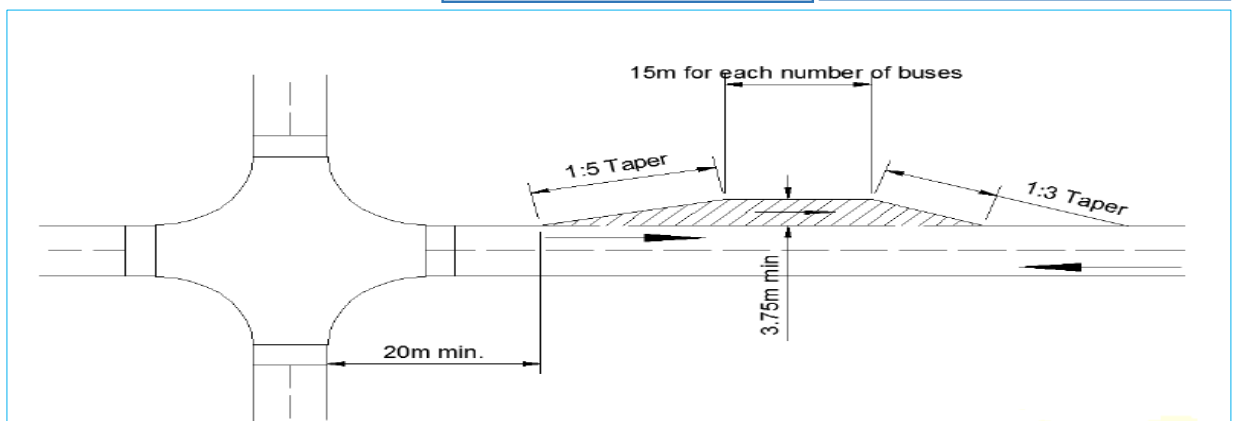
Typical Plan of Bus Stop & Bus Bays
